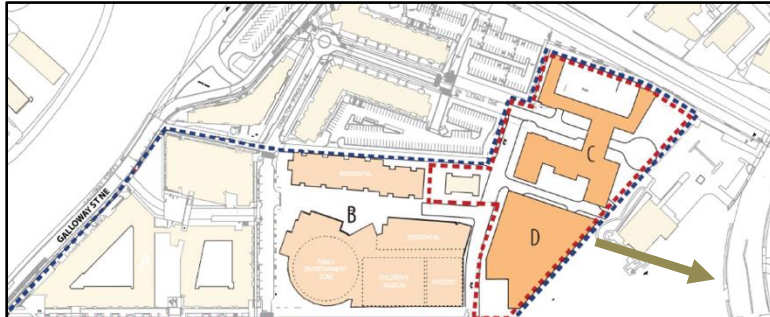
PUD Site Plan, with Completed Building A to Left and Current Application's 2nd Stage PUD Labelled "B"
